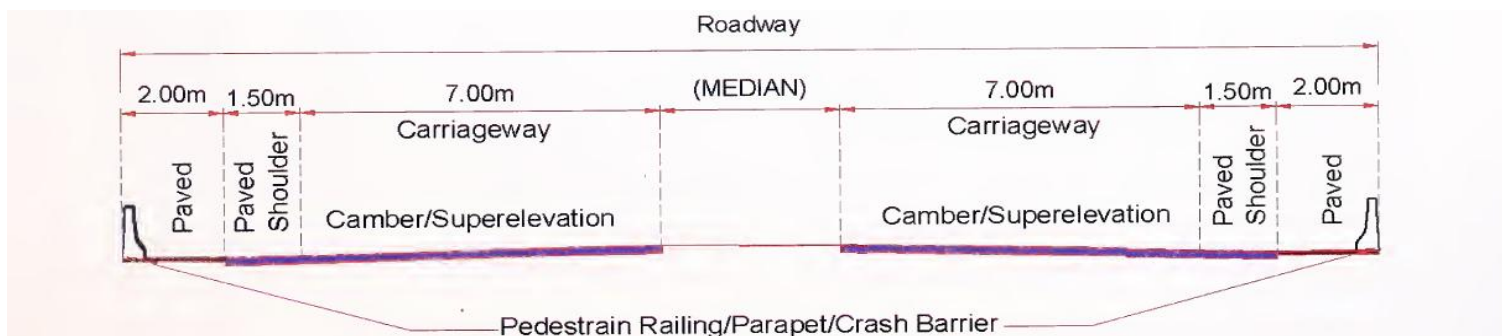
Cross Section of Slab/Box Culvert at Road Level 4-Lane Divided Highway
